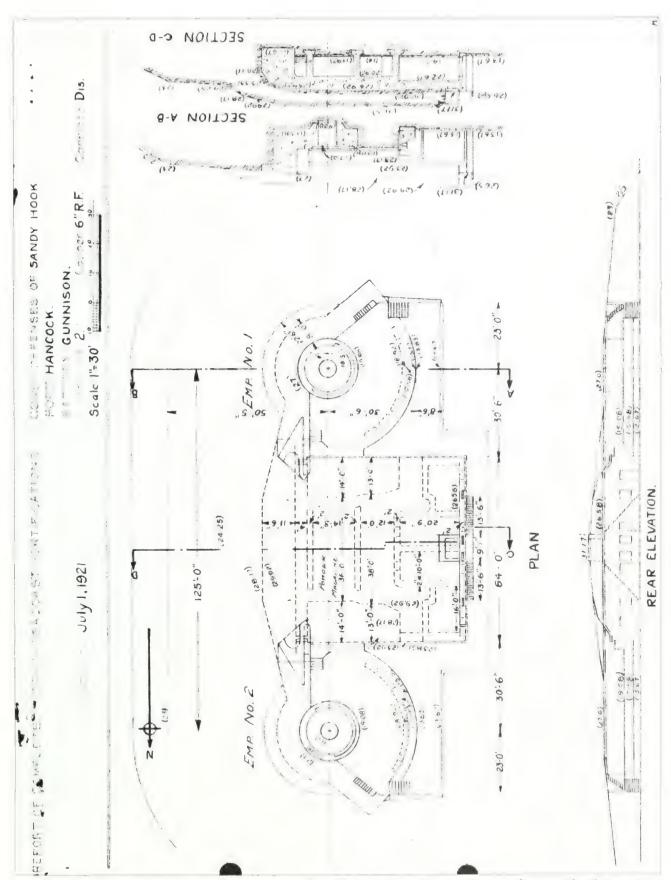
Plan, elevation, and sections of Battery Gunnison, 1921. Between Battery Gunnison's two emplacements, interior rooms used for communications, offices, and equipment storage were shielded with concrete and earth cover that rose three and a half feet higher than the top of the parapet wall (Report of Completed Works, CDSG ePress).
